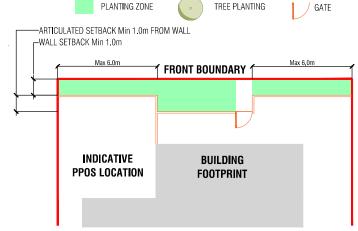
EXAMPLE - COURTYARD WALL, SHOWING A HOME FRONTING OPEN SPACE, WITH AN ARTICULATED GATE ENTRY AND PLANTING ZONE.
